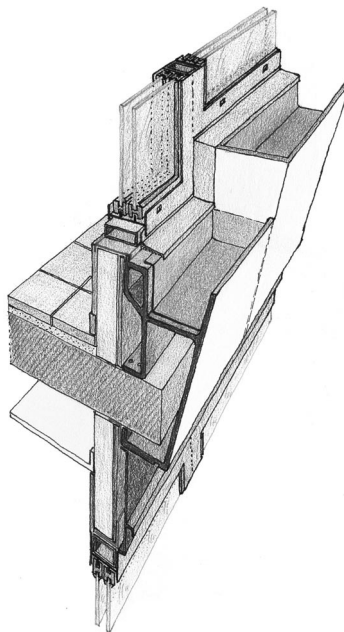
Detail from prefabricated facade with the retaining elements of the modular boxes. Ciudadela building. Valencia. Architect, GO.DB. Architects. (Designed by: Vicente Blasco, 2016. Private Archives of Vicente Blasco.)
